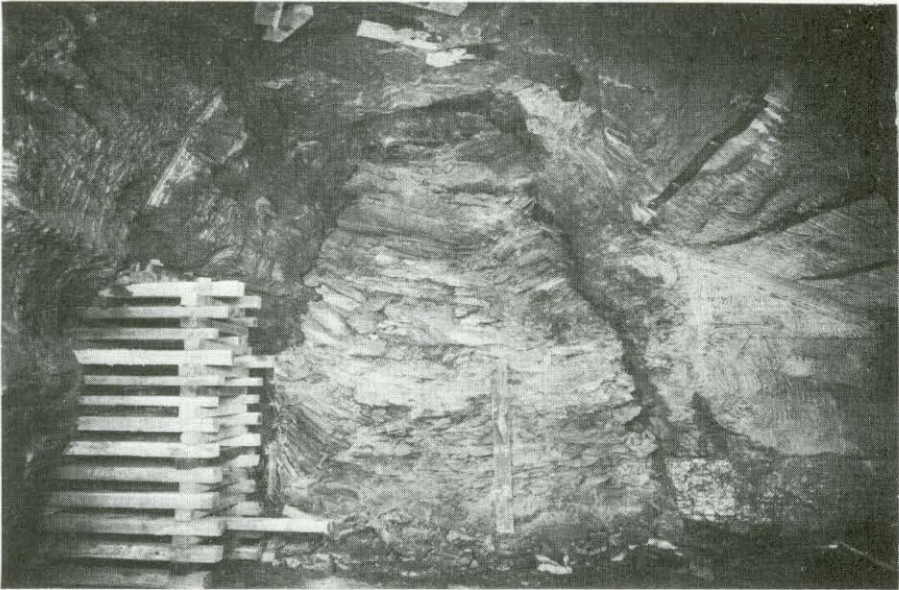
Roof fall as result of cutter roof failure in study mine. Numbers on board represent feet above floor rock.
